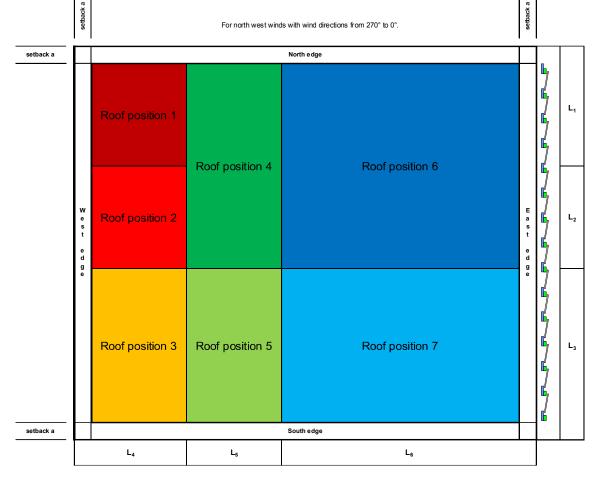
Definition of roof zones for the solar ballasted roof mount system "FastRack 510" with a minimum offset "*a*" from the roof edges equal to or greater than 1.0 m and for north west winds from 270° to 0°; valid for flat-roofed buildings with a maximum roof angle of 7°
